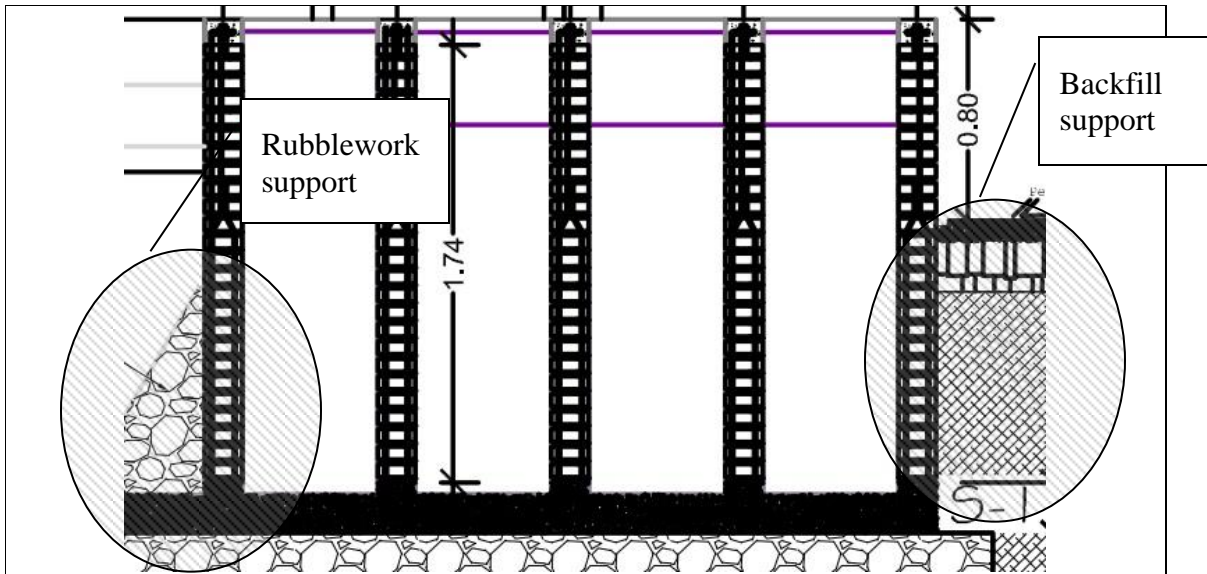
Elevation view of the Flocculator tank in the Alauca plant. The rubblework and backfill which affect the structural analysis of the walls and columns are marked. The figure also shows the change in the number of rebar in the wall 0.80 m down from the top of the wall. We discuss changing the number of rebar in the wall in the Results and Discussion section of the report.
